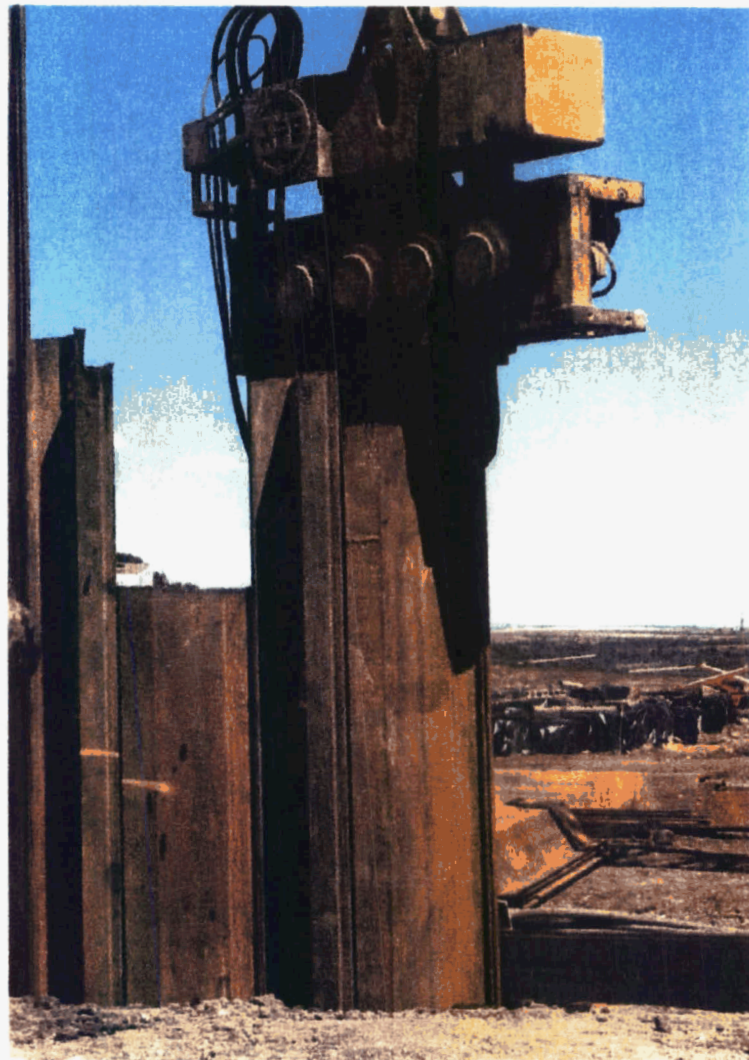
Vibratory Driver/Extractor Installing Sheet Pilings
